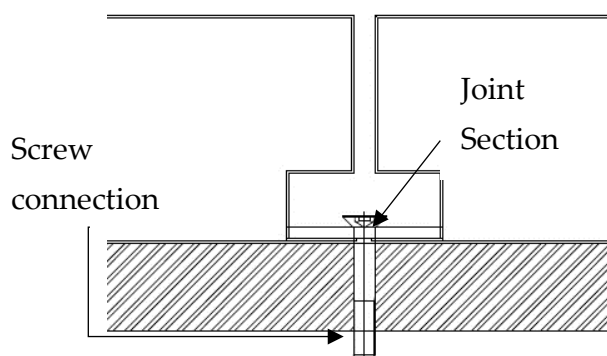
Screw connection of the *EcoSteelPanel* water wall.
